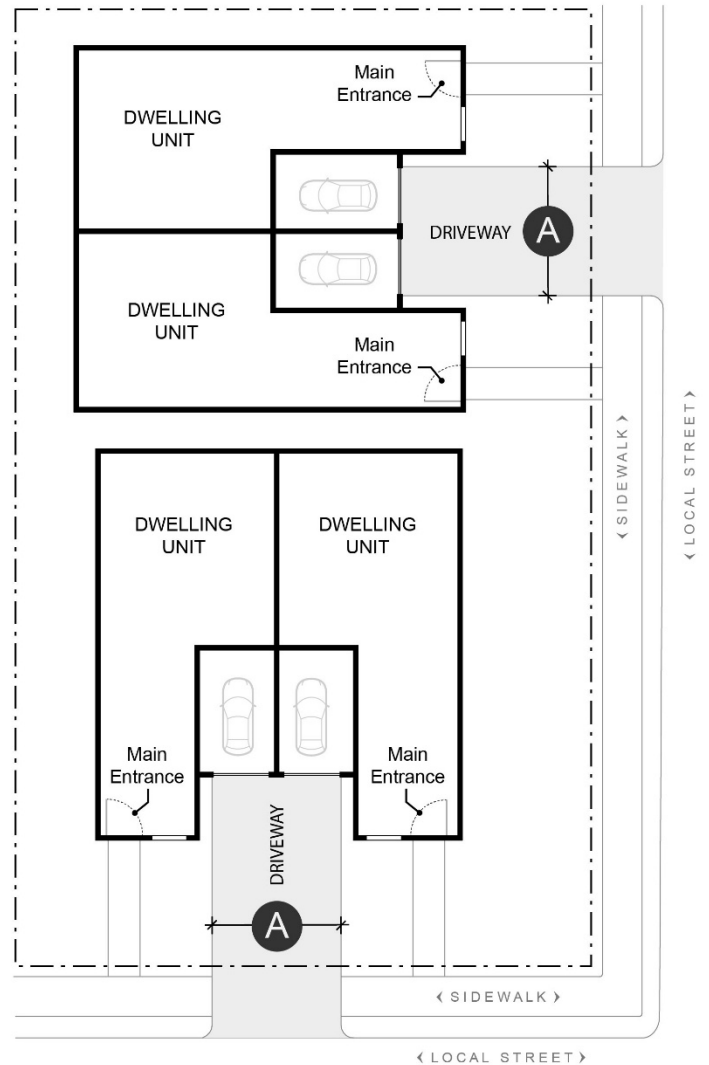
d. Driveway Approaches on One Local Street Frontage
